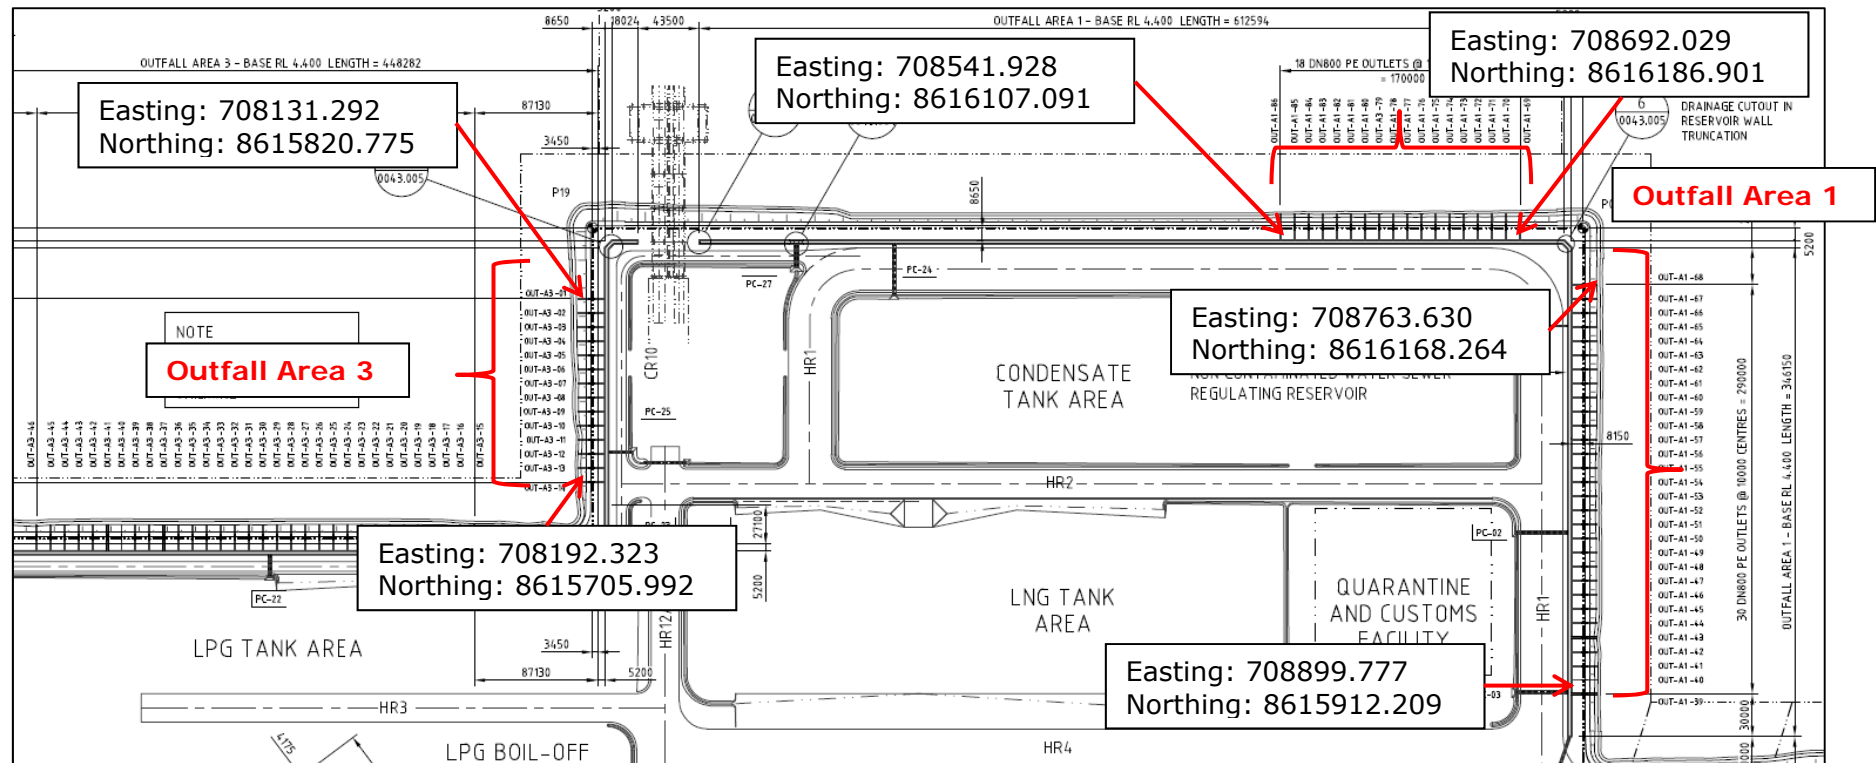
Location of outfalls in outfall areas 1 and part of outfall area 3
